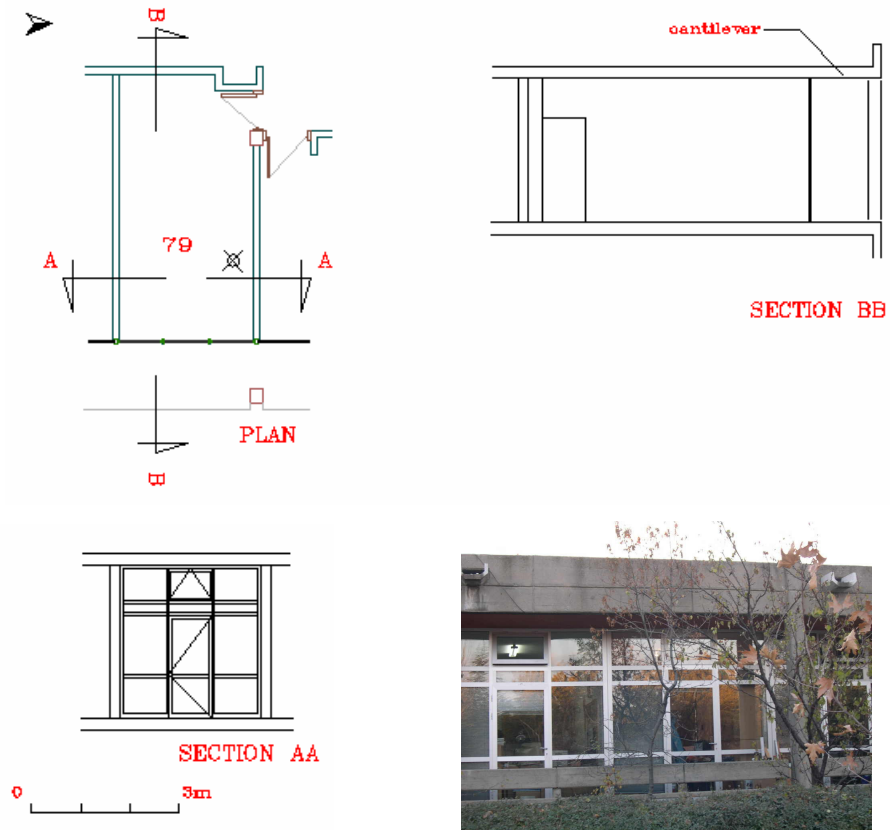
Floor plan, section AA, section BB and exterior view of Room 79.
